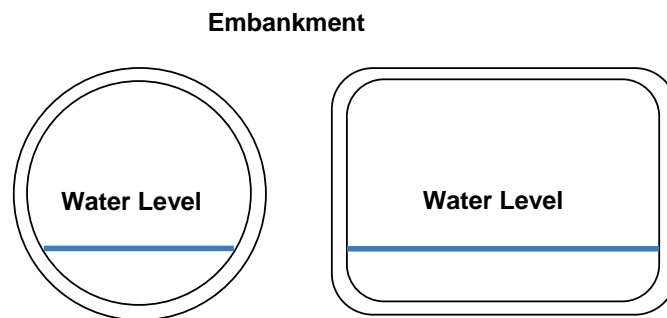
CROSS SECTION OF A CIRCULAR CULVERT AND BOX (RECTANGULAR) CULVERT.
